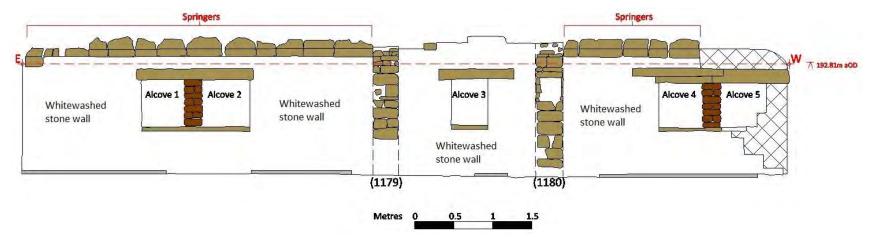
North facing elevation of wall (1173) showing storage alcoves, supporting partition walls and a partial course of angled stones (springers) along the upper length of the wall that might once have supported a barrel-vaulted ceiling.
